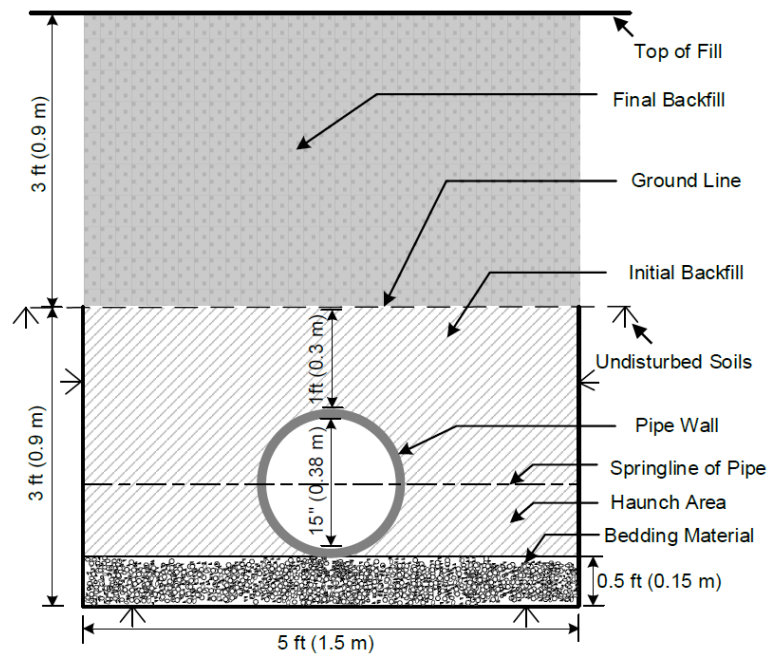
Profile section for installed drainage concrete pipe in a trench.
